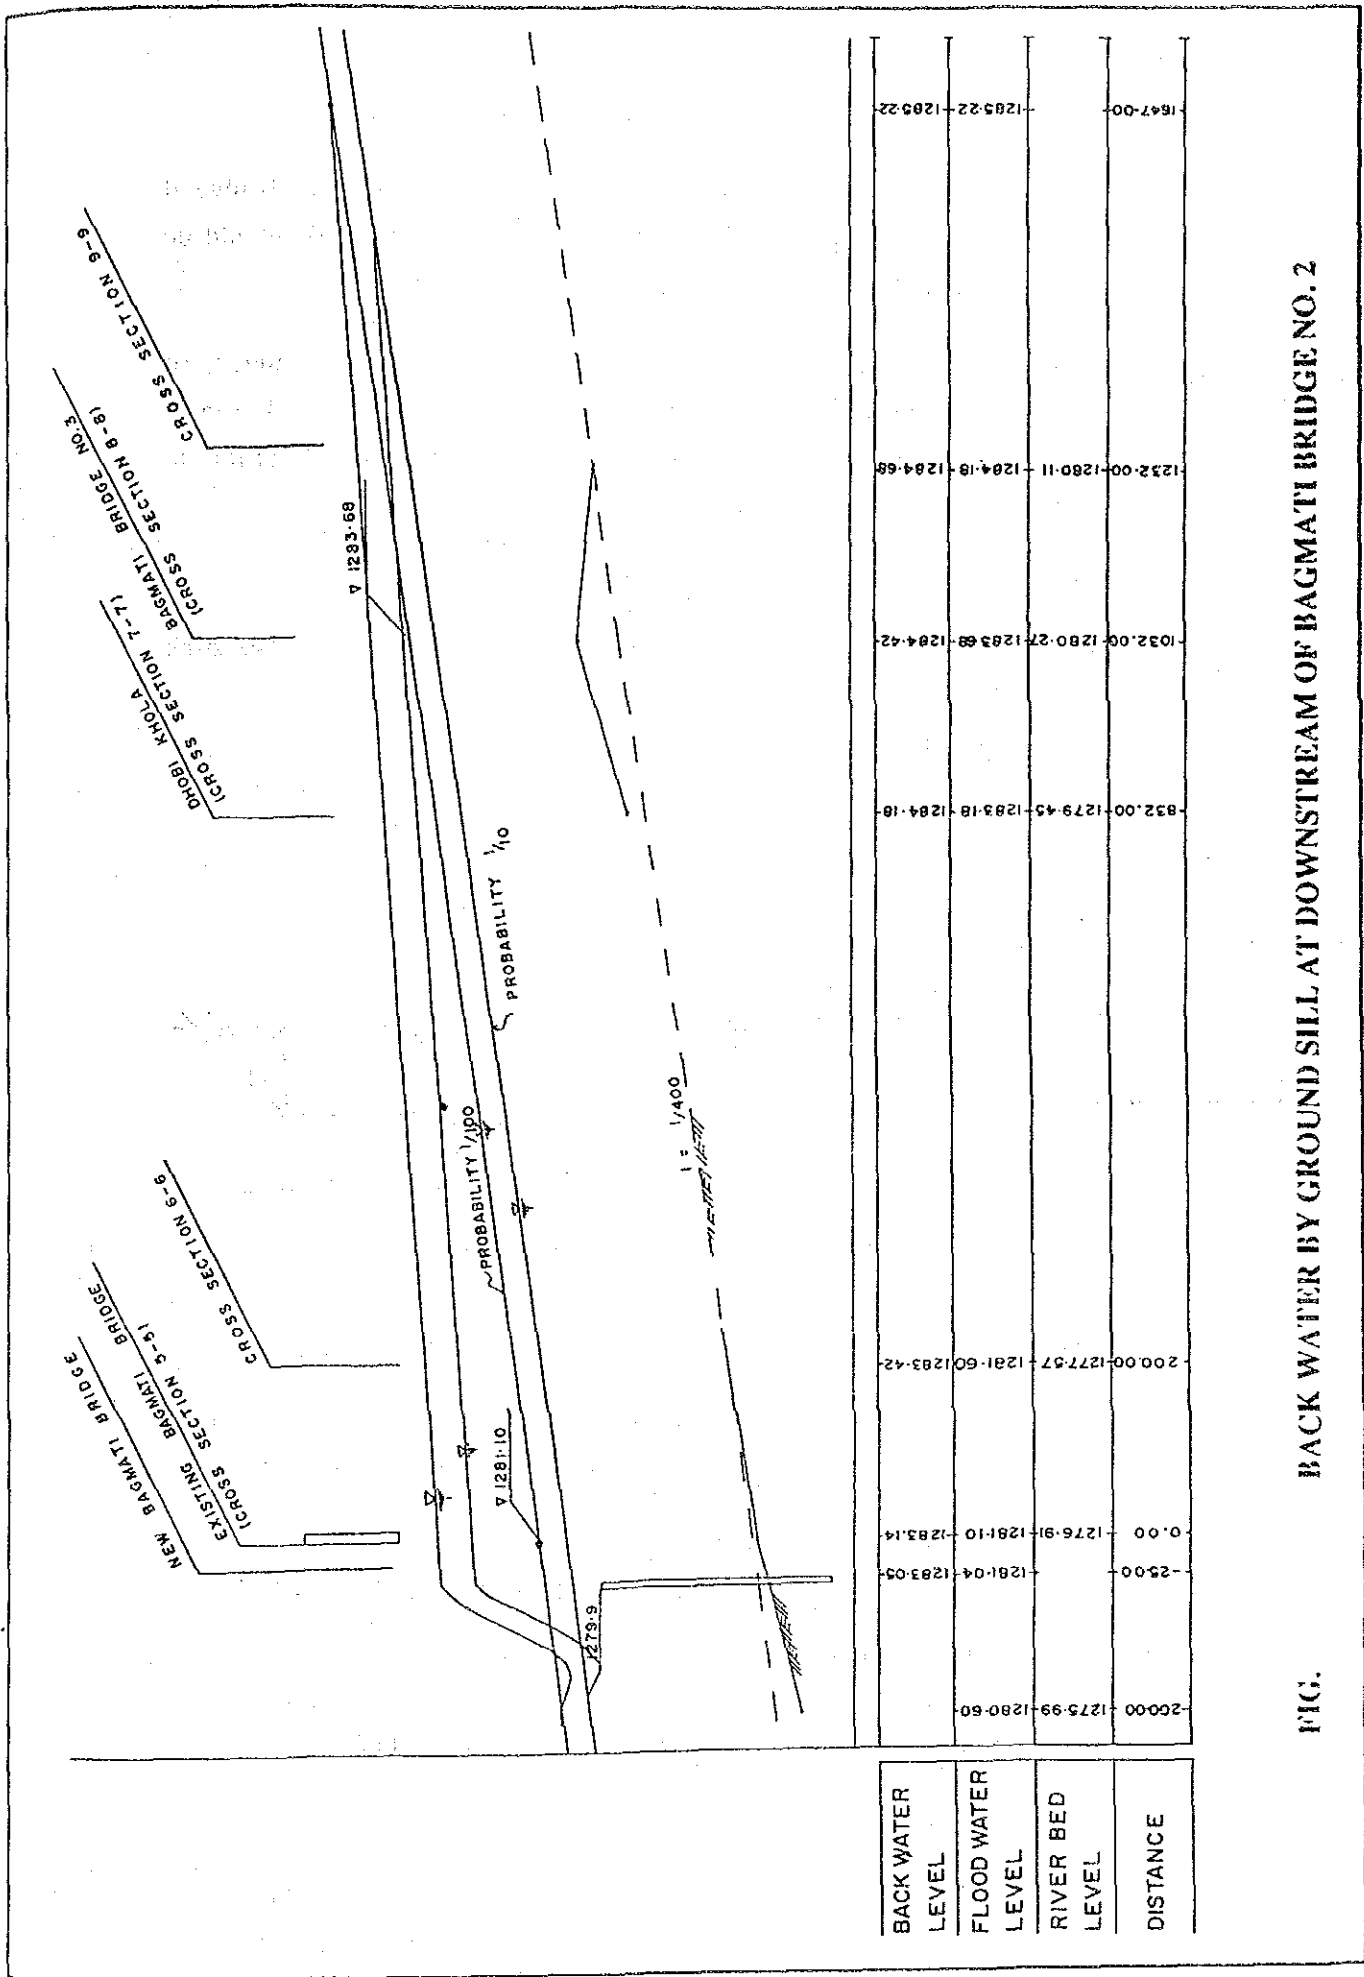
FIG. BACK WATER BY GROUND SILL AT DOWNSTREAM OF BAGMATI BRIDGE NO. 2
